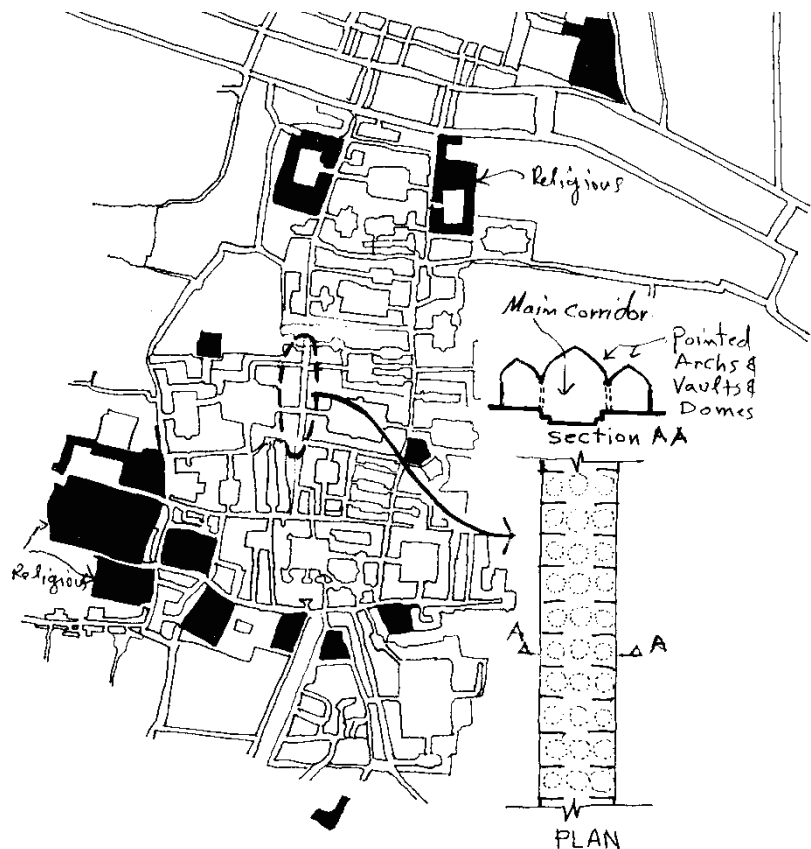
Layout plan & detail of Tabriz Bazaar, Source: Authors
